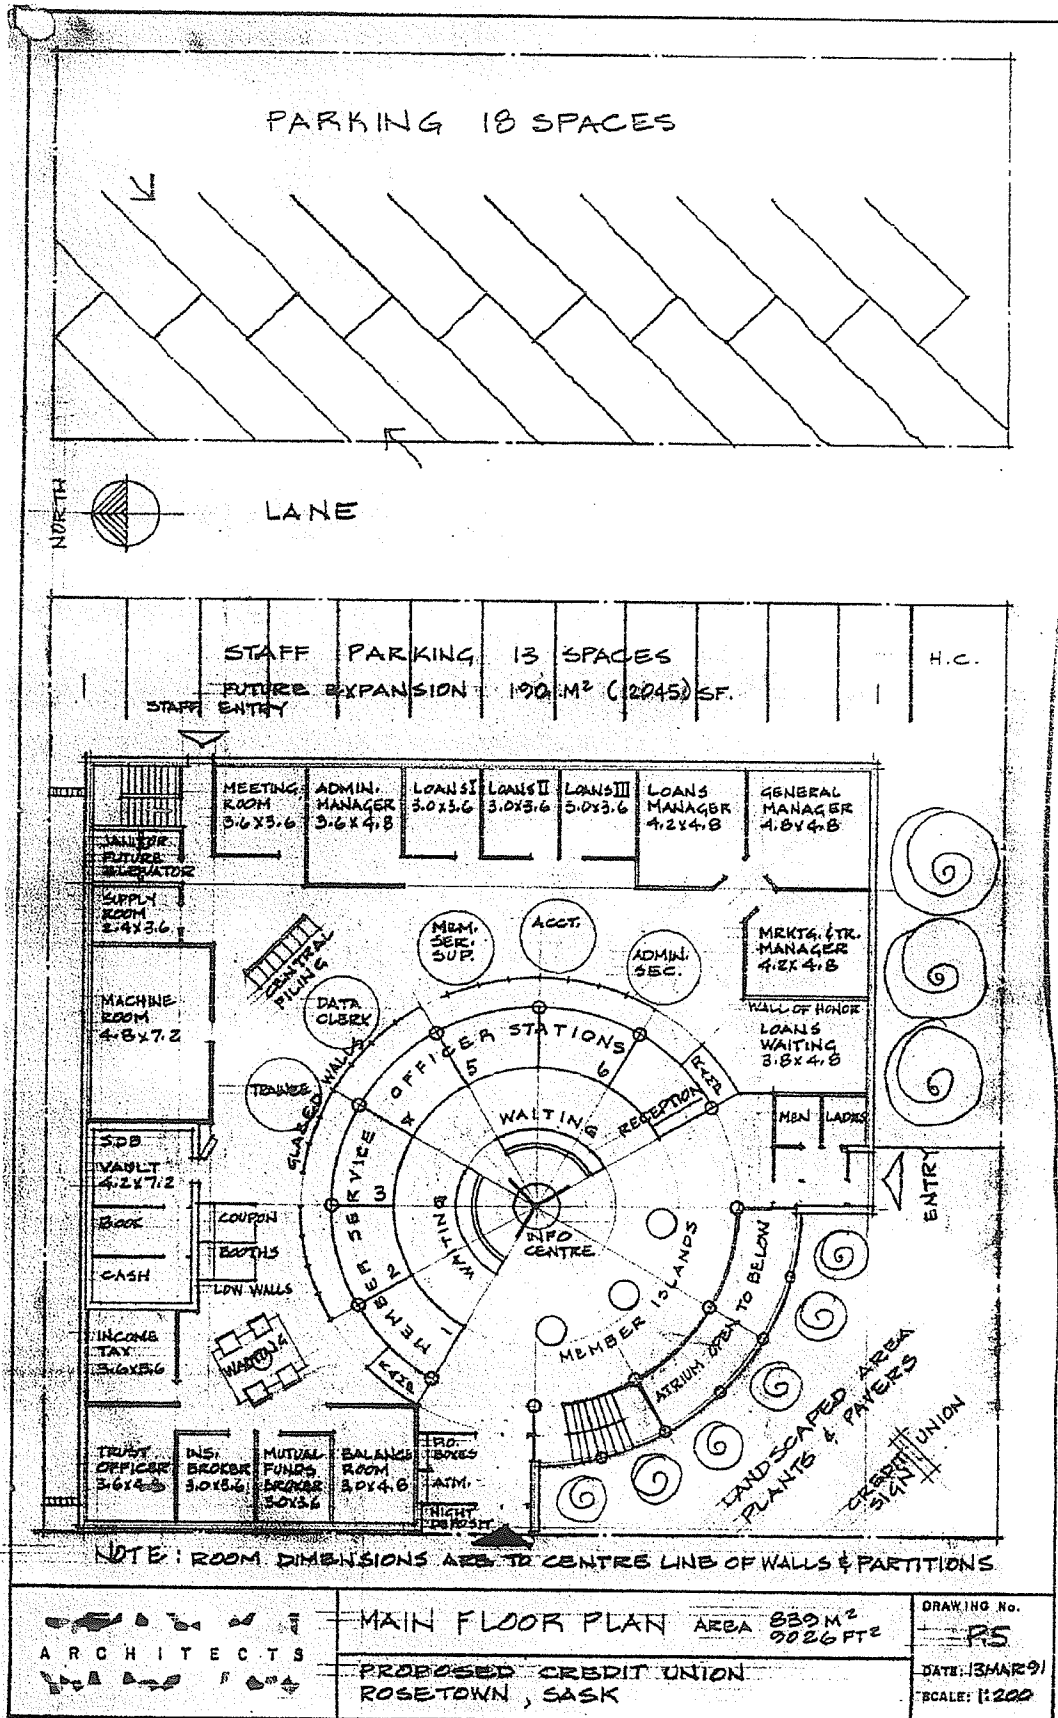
Architect design sketch 5, Main Floor Plan. Courtesy of the architect.
